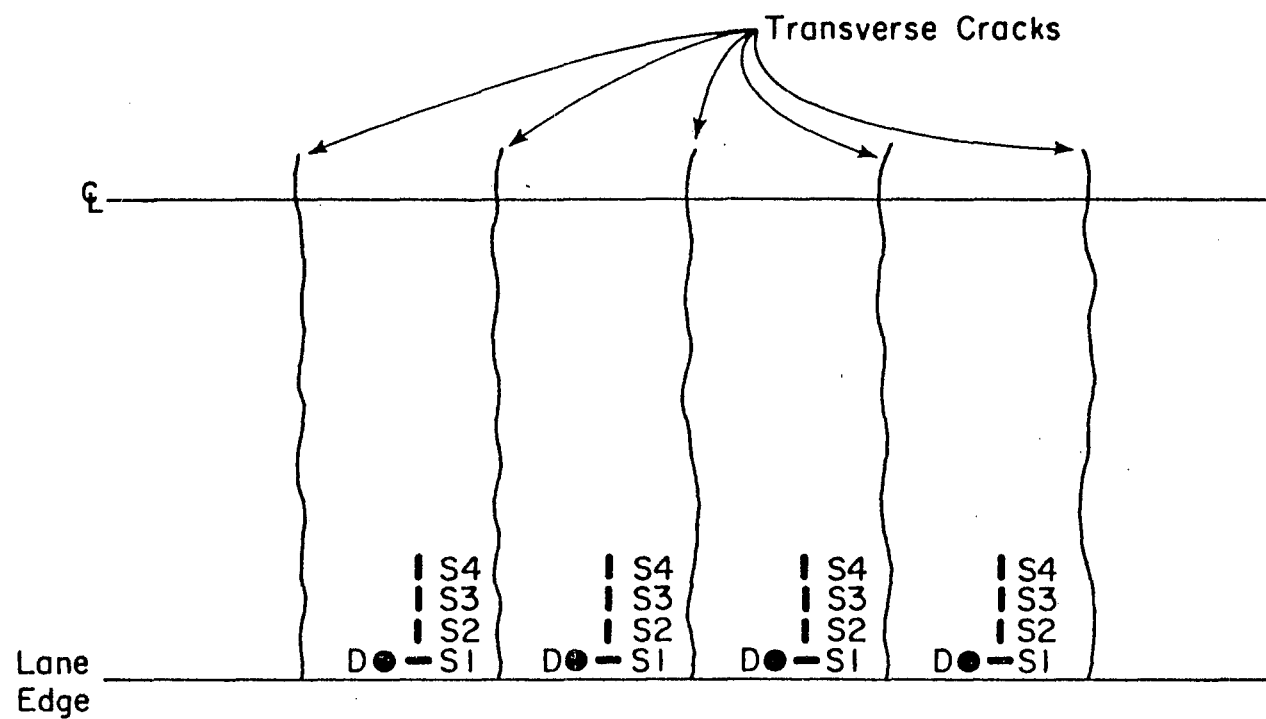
Typical Instrumentation for Sections 1, 2, 3, and 5
